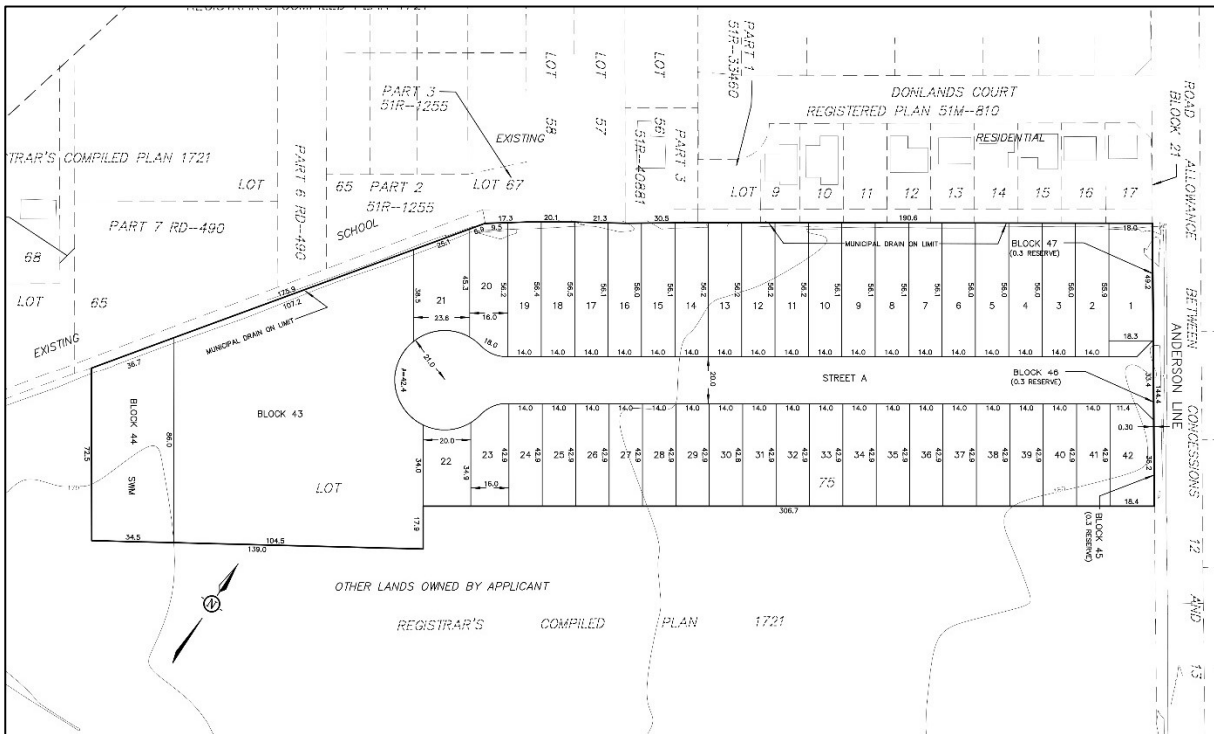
Proposed Draft Plan of Subdivision (Spurling Surveying Inc.)
